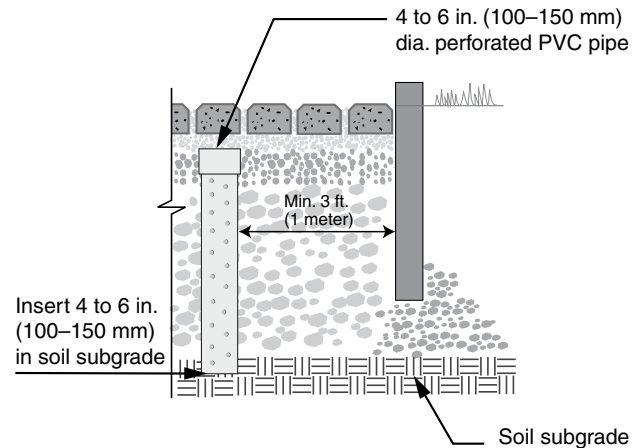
Observation well with top hidden under pavers and bedding to obscure from vandals.
